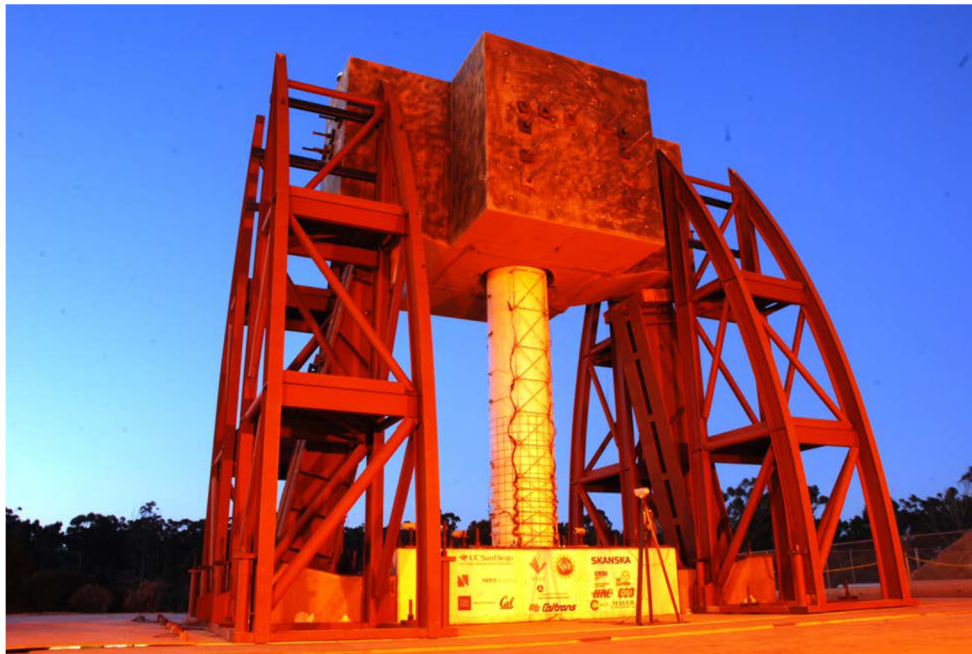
Full-scale bridge column test setup [Schoettler et al. 2015].
